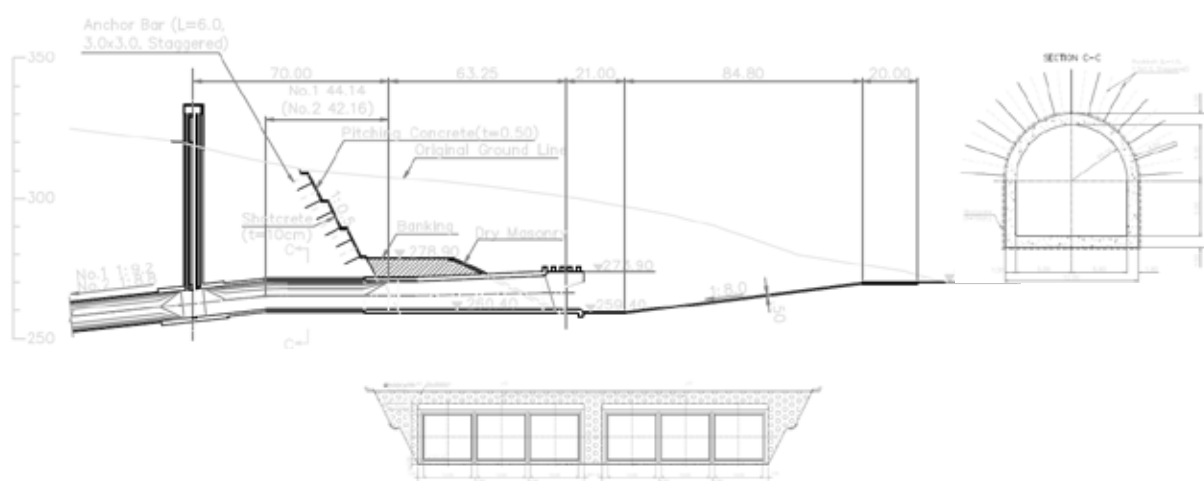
Tailrace Profile & Section and Outlet Section
